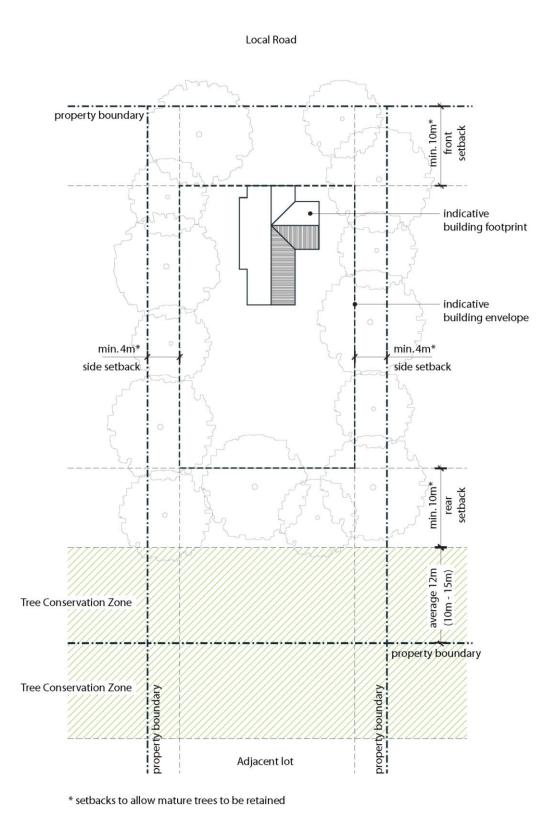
Northern Ridgeline Indicative Subdivision Concept
